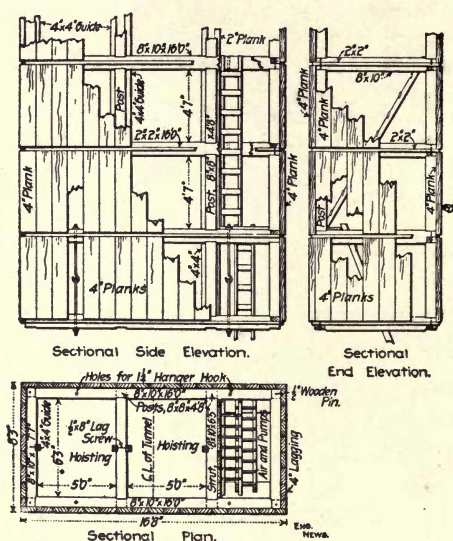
Plan and Elevation of Shaft at Aspen Tunnel.
